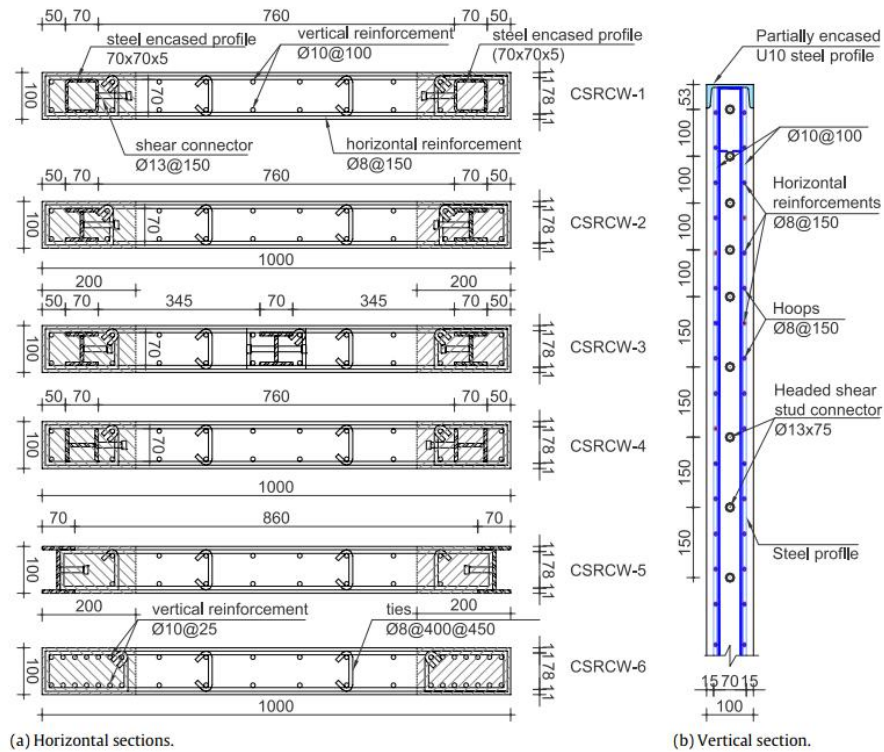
Details of wall specimens in Dan et al. (2011).
